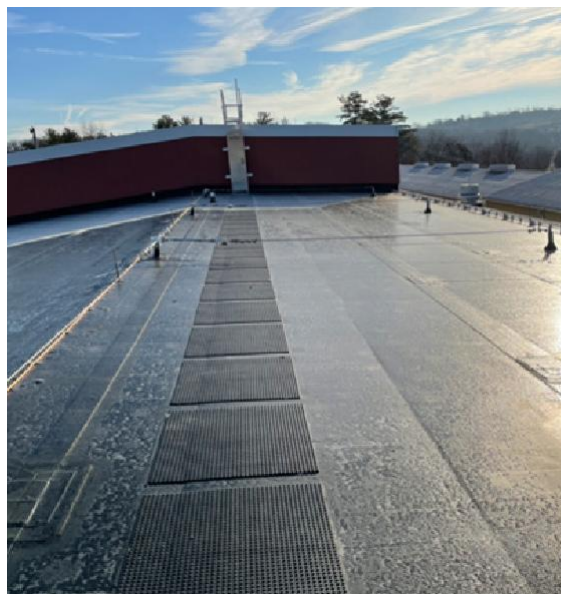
B-167 new roof with fall protection and lighting protection system.
